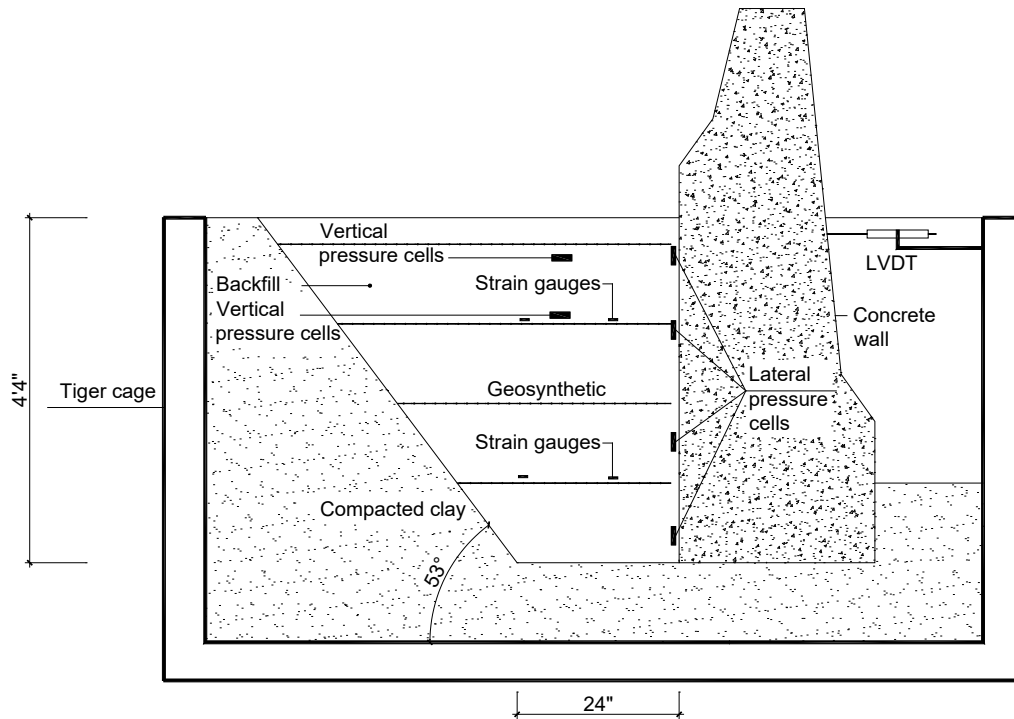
Model test of GRS wall with 3" distance from wall face to geosynthetic tip with 12" geosynthetic spacing (Test 1)
